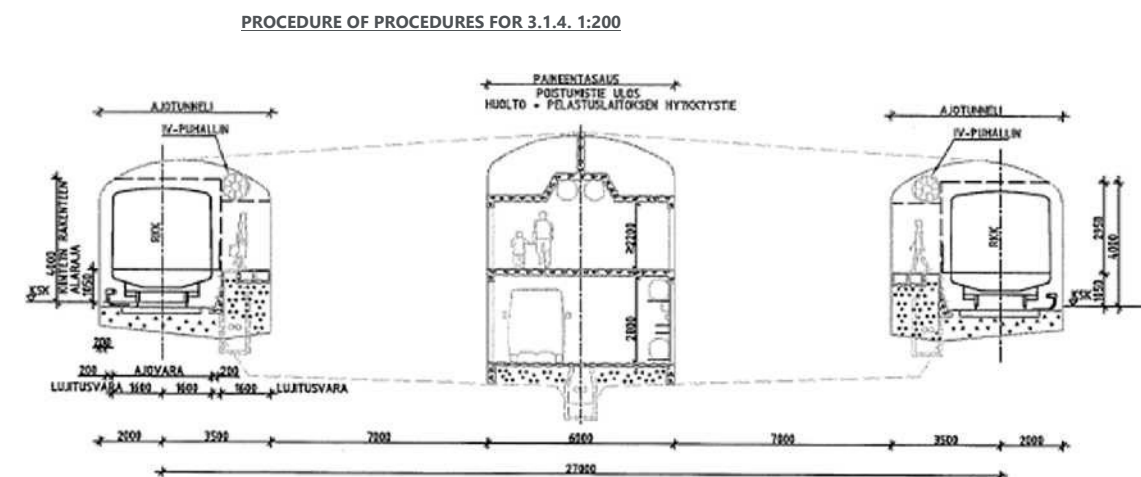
Metro track tunnels and separate escape and survival tunnels.
